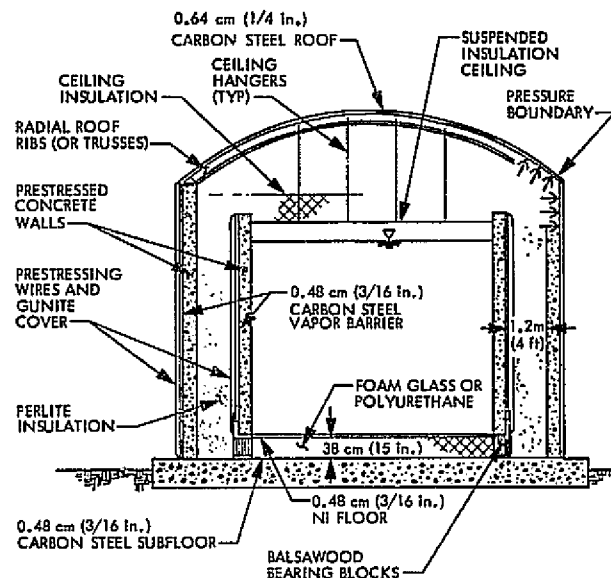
Double-Wall Prestressed Concrete Tank for the Storage of LNG Typical Cross Section (Not to Scale)
